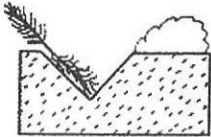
B: Break bundles and spread along the trench wall with two-three inches between each plant.
